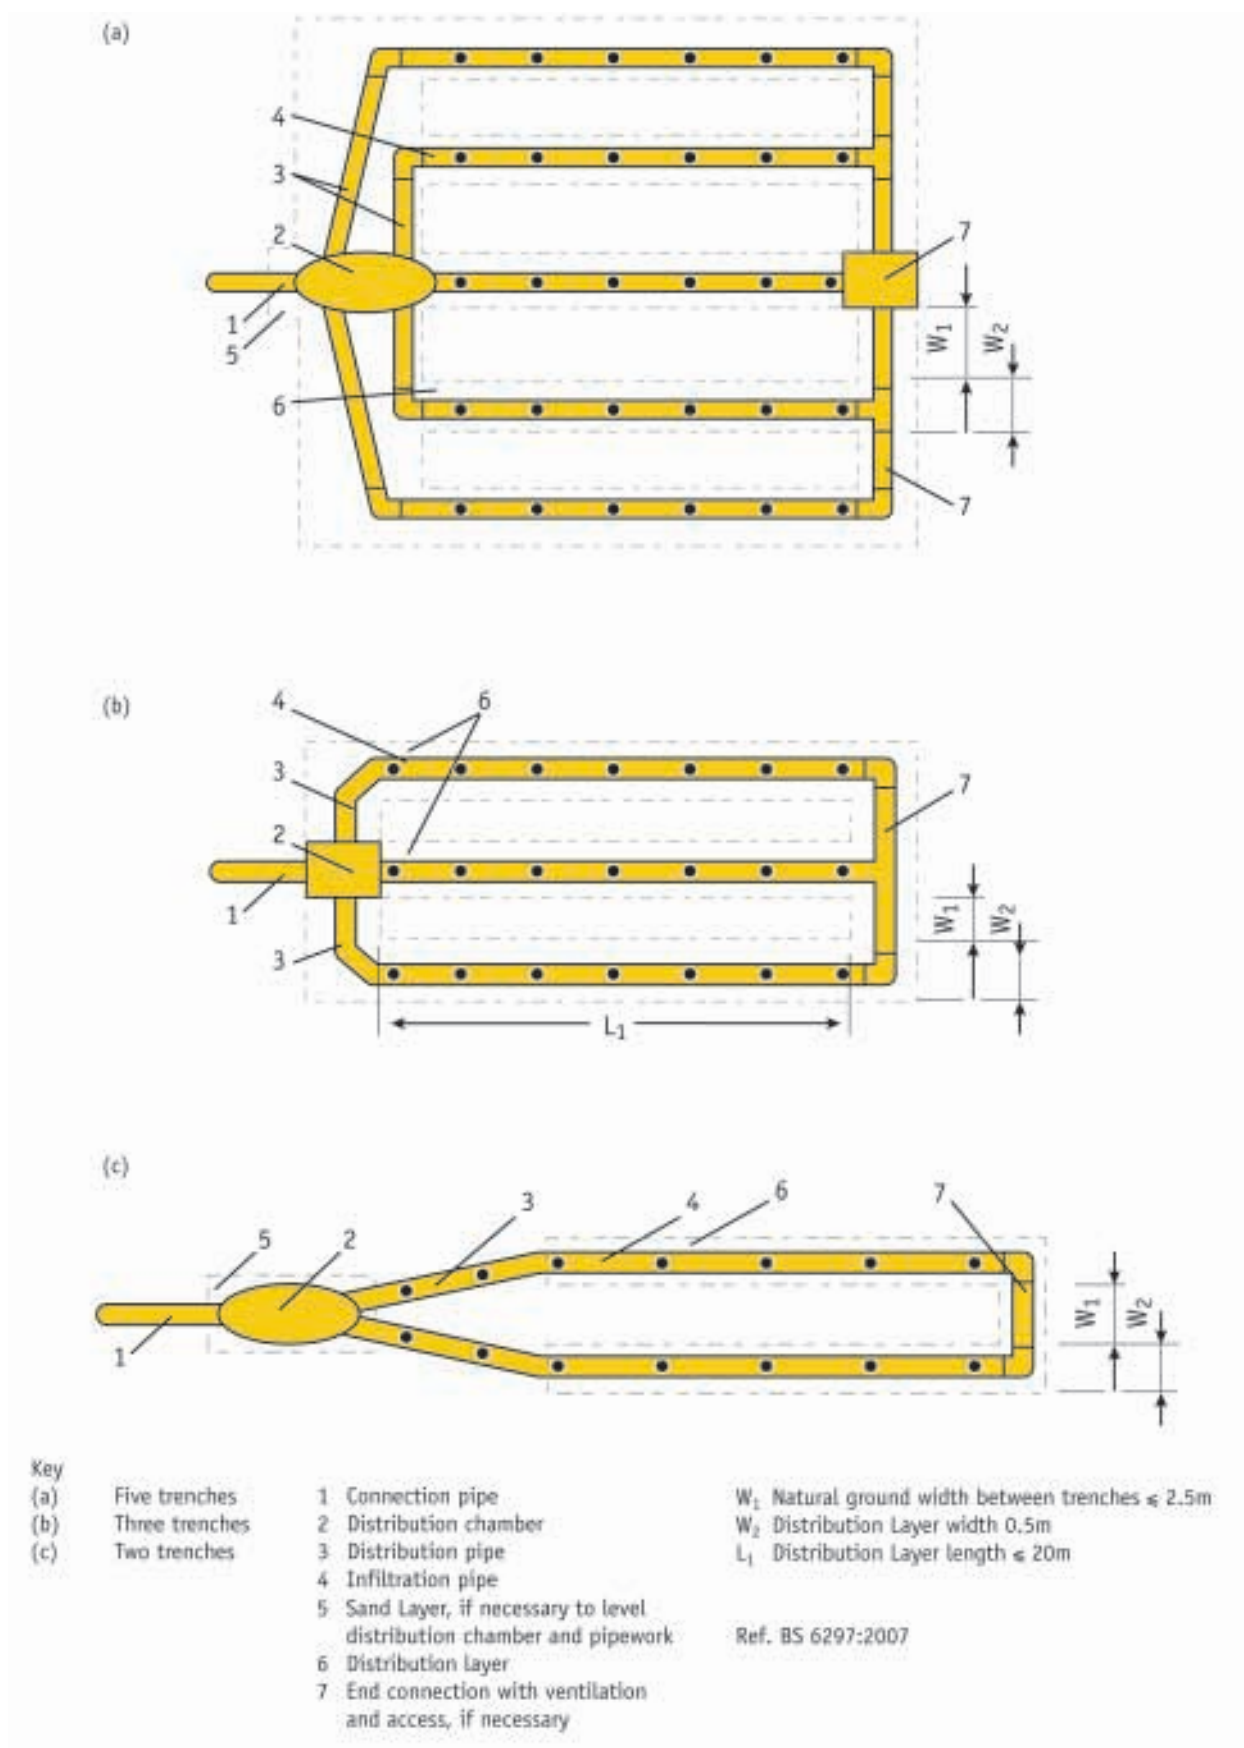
INFILTRATION TRENCHES – LAYOUT EXAMPLES.
